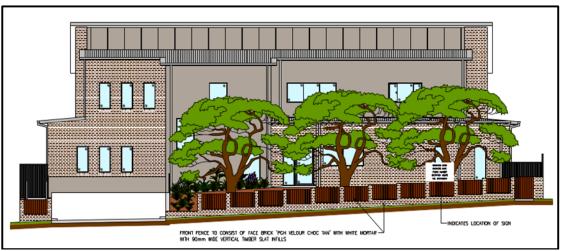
Front (western) streetscape elevation as viewed from Plane Tree Drive.
